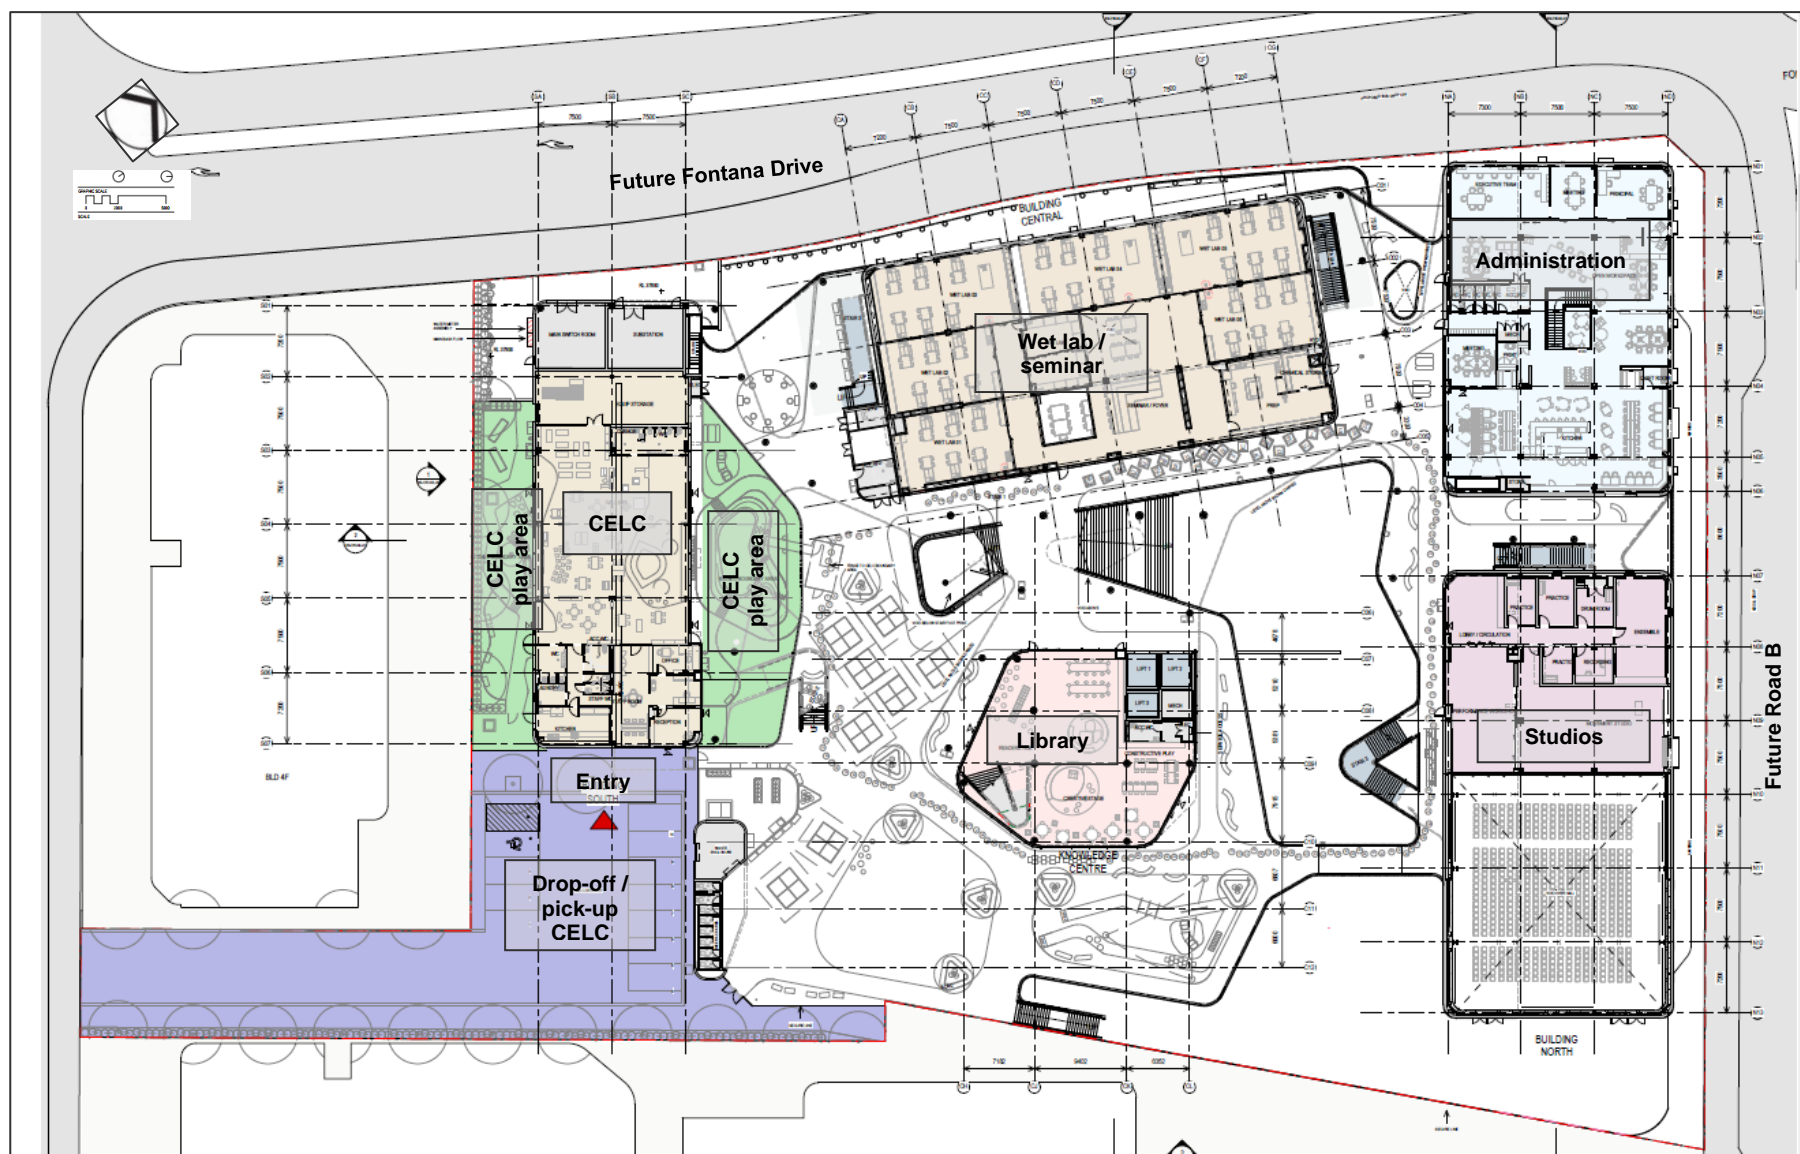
| Proposed Ground Level (Source: Applicant's SRtS)
